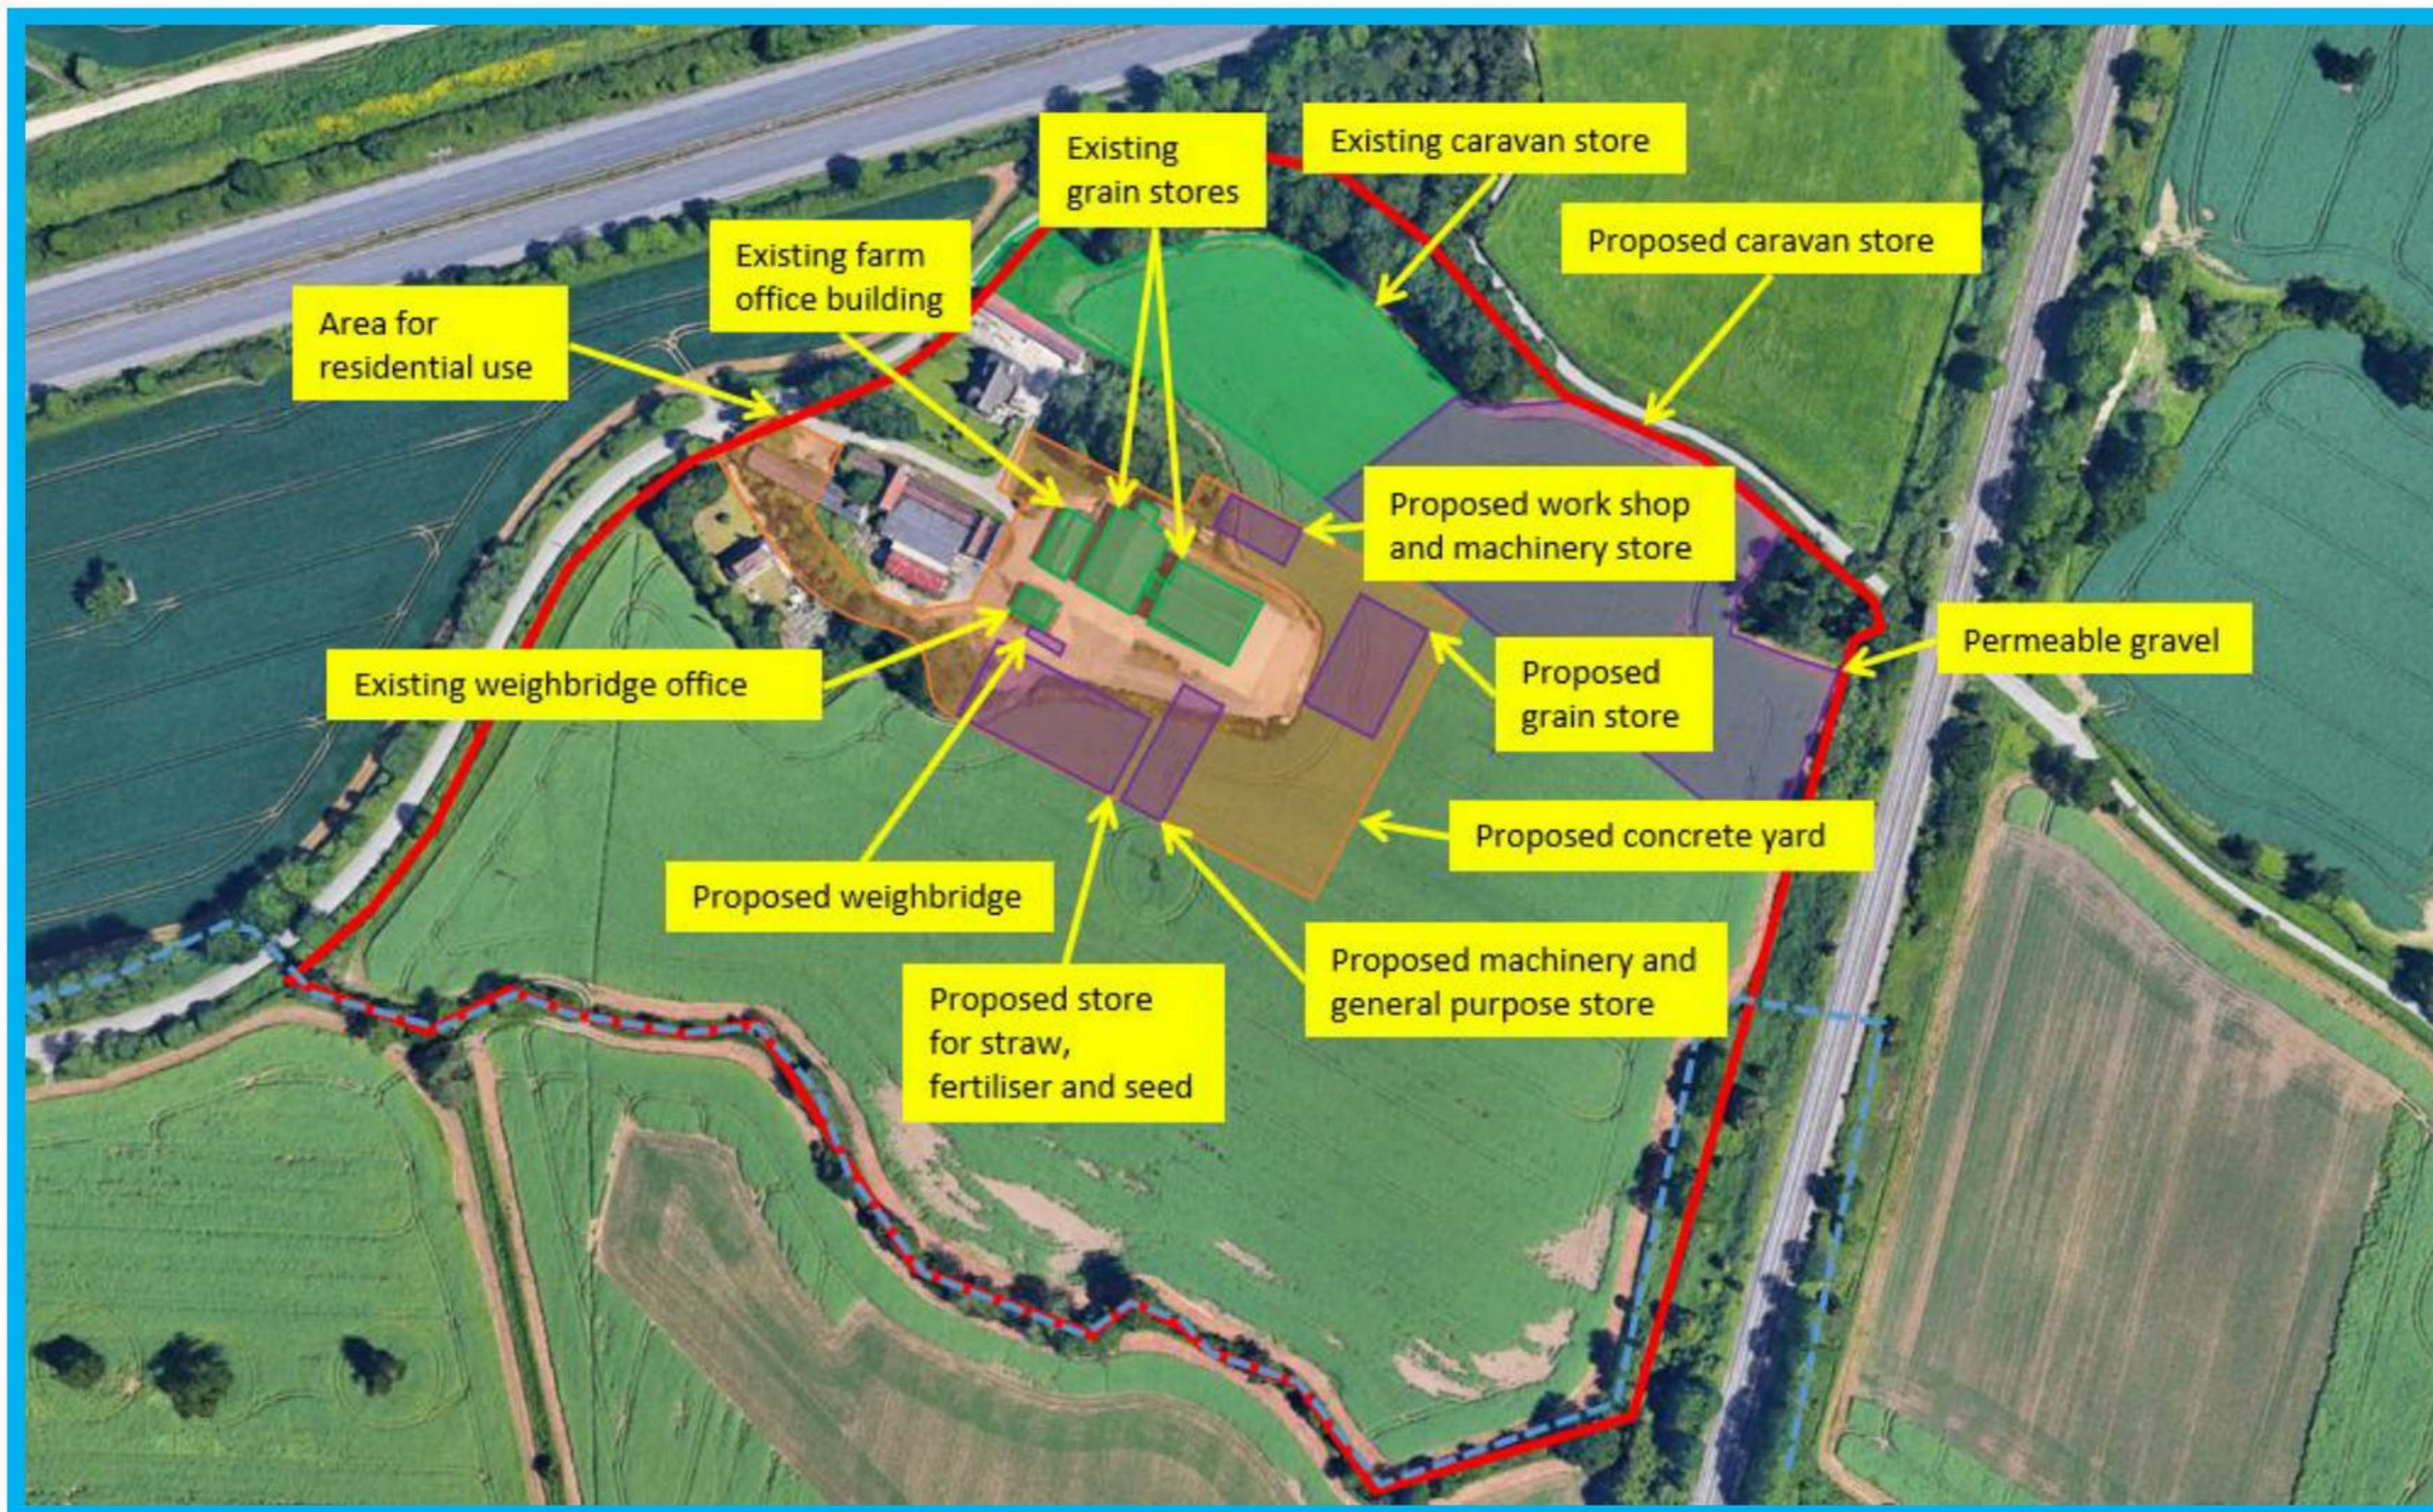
Proposed site plan superimposed on Google Earth satellite image.
